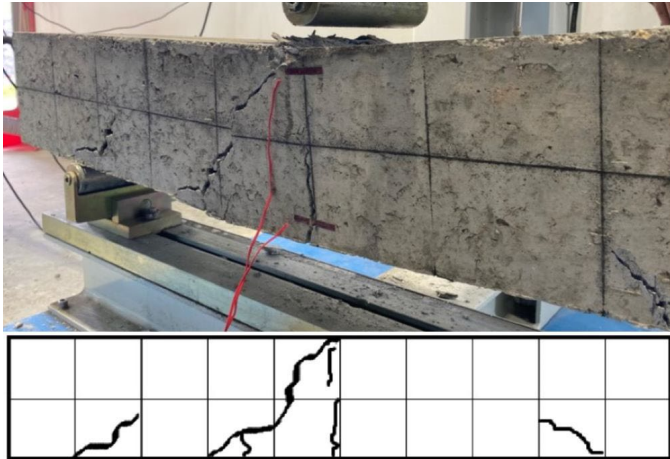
Reinforced concrete beam's crack pattern with 20% EPS
